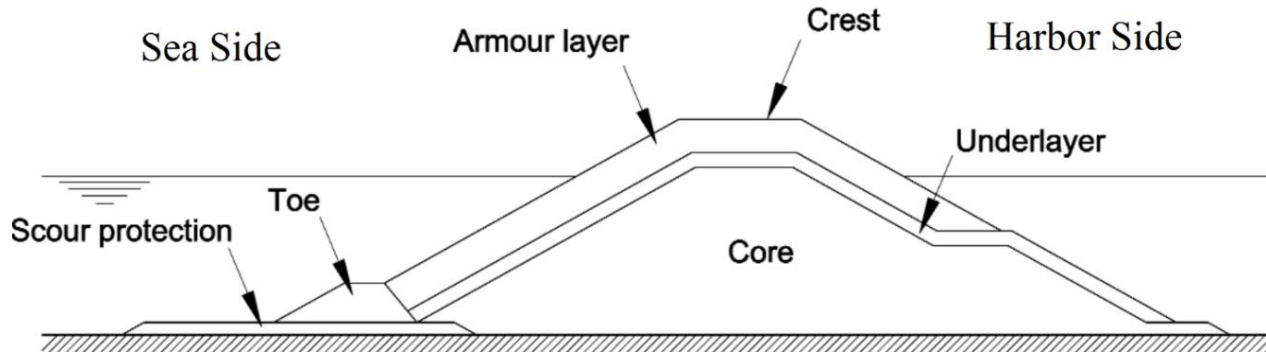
Cross section of typical rubble mound breakwater (CIRIA et al., 2007).
